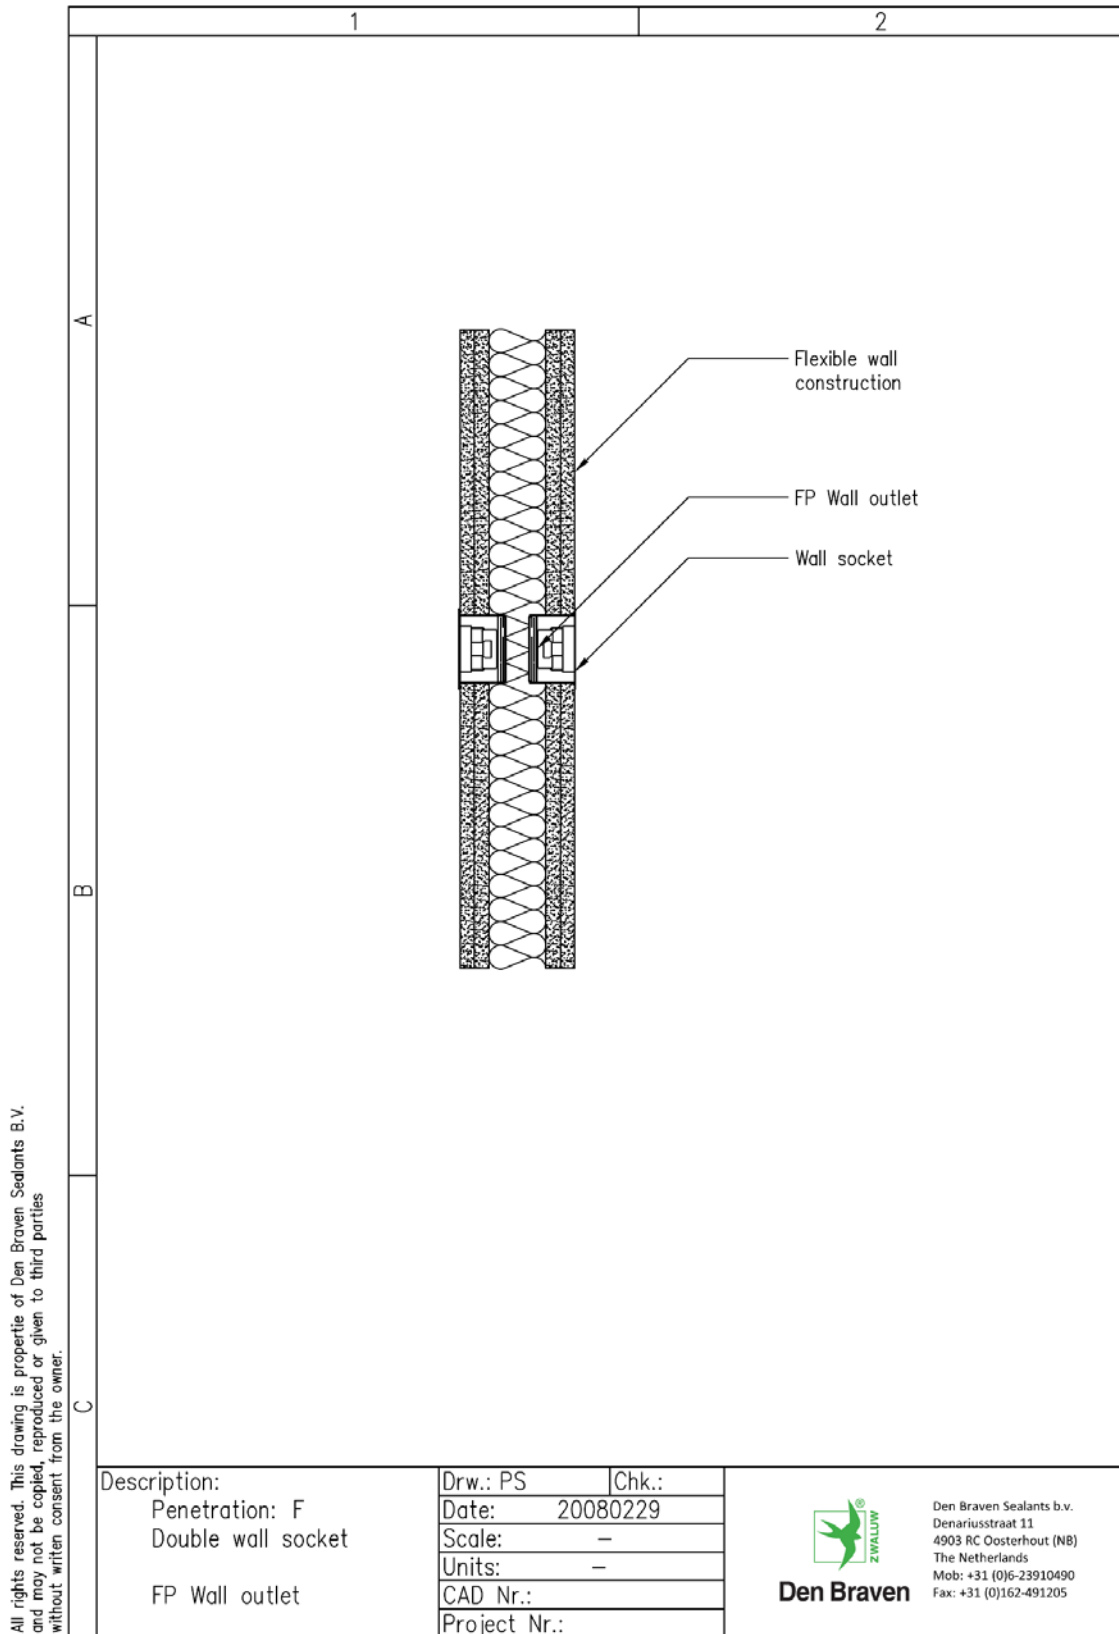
Detail FP Wall outlet, based on report 2008-Efectis-R0458[Rev.2]
